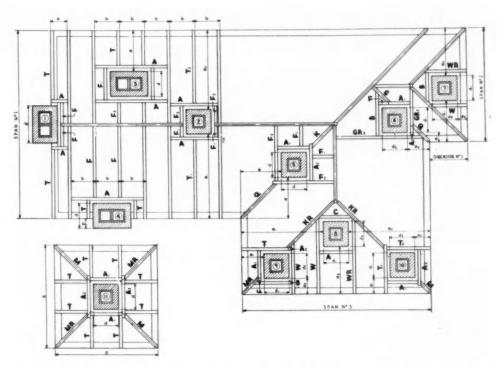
Diagrammatic roof plans illustrating framing methods and member calculations for typical chimney positions. Note: Figures substituted for a. d. e and s in calculations must be
